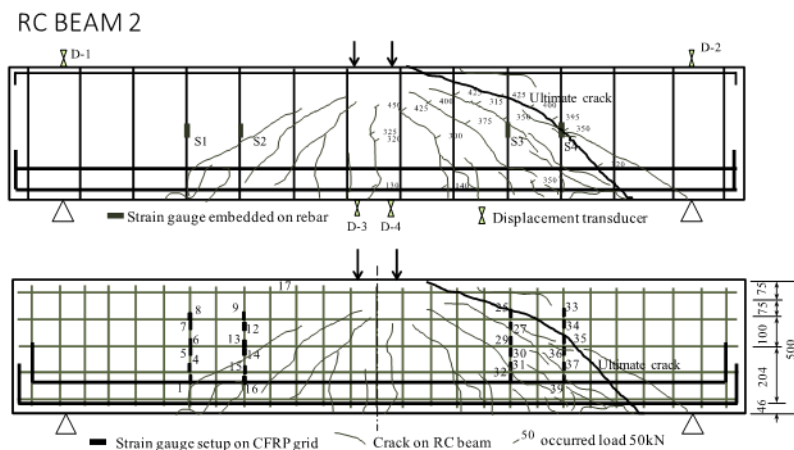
Locations of strain gauges on stirrups and experimental cracks in RC beam 2
